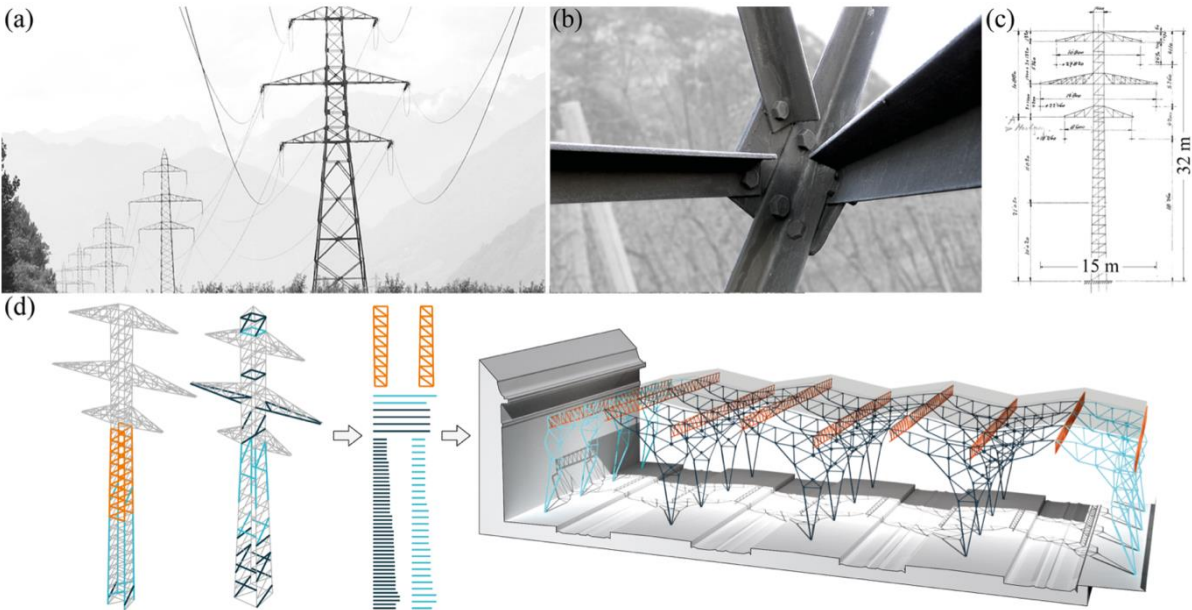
Case study Lausanne Train Station roof: (a) typical power line and electric pylons, (b) connection detail at a pylon corner, (c) archive plan of an electric pylon and (d) roof design strategy and concept (Brütting, et al., 2019).
